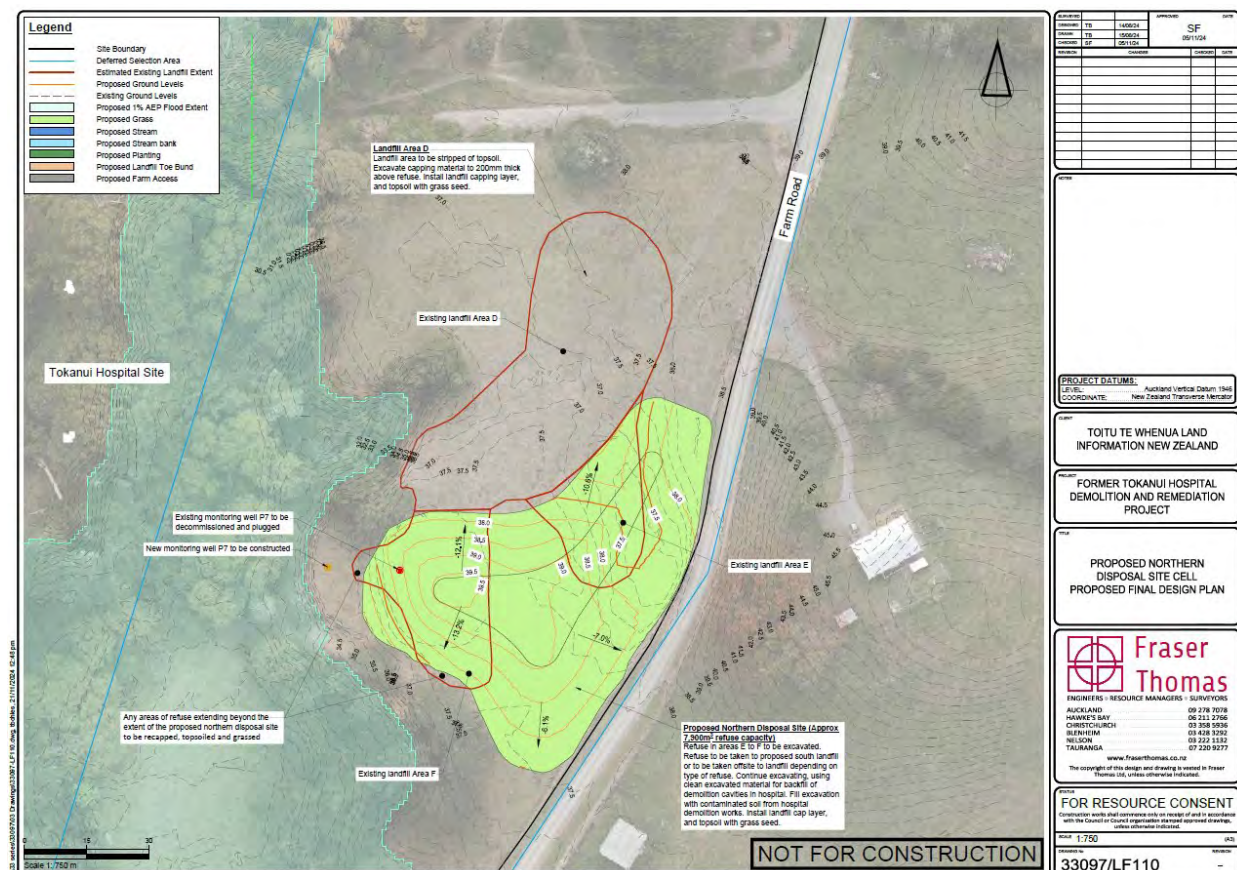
Proposed Northern Disposal Site Cell – Proposed Final Design Plan
